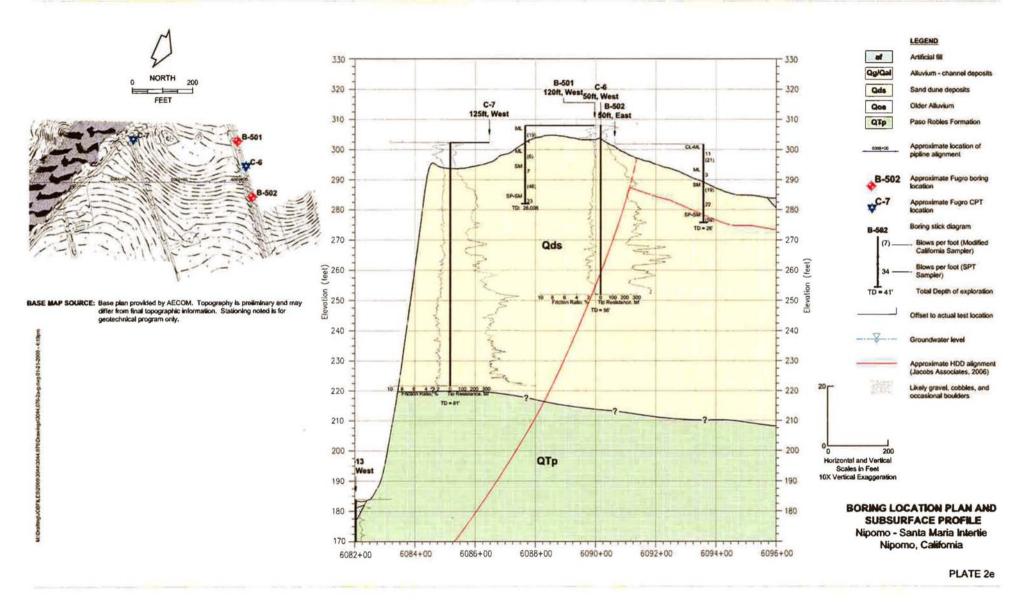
Boring Location Plan and Subsurface Profile (Fugro West, Inc.)
